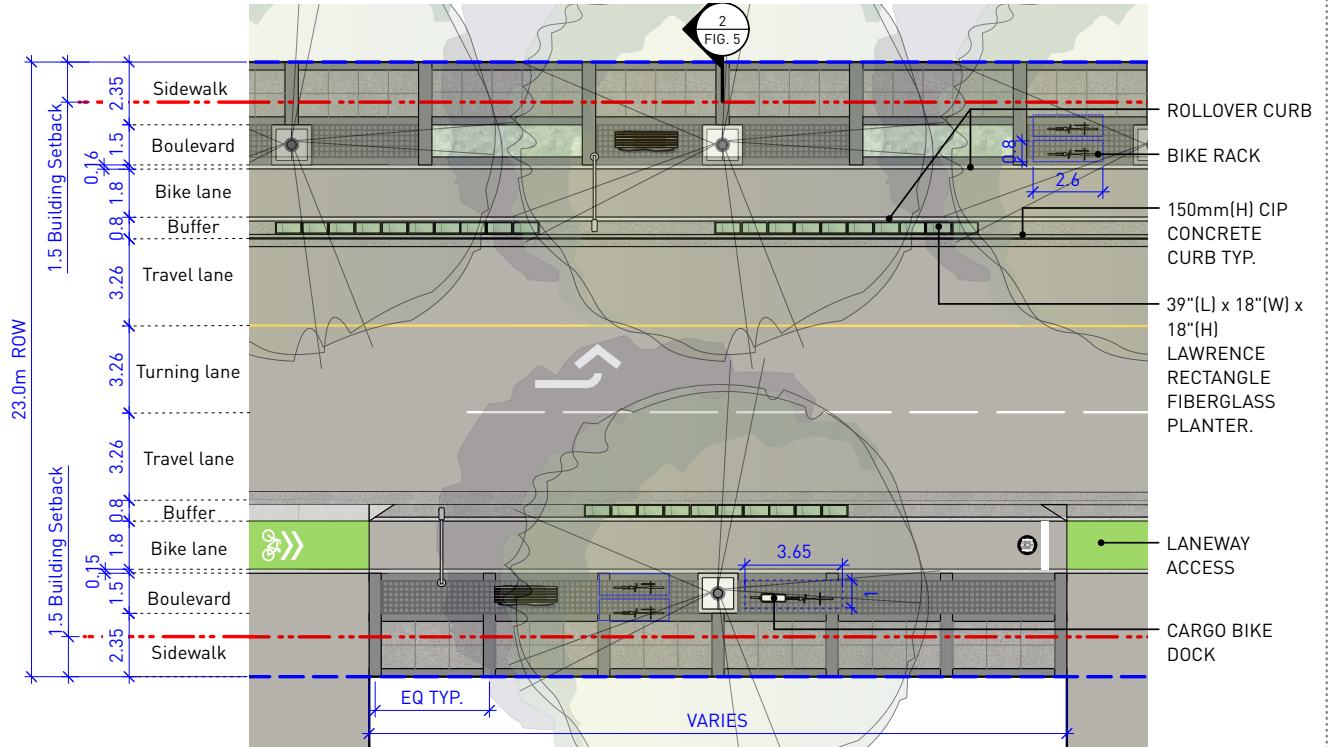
ENLARGEMENT 2 - TURNING LANE AND LANEWAY ACCESS
